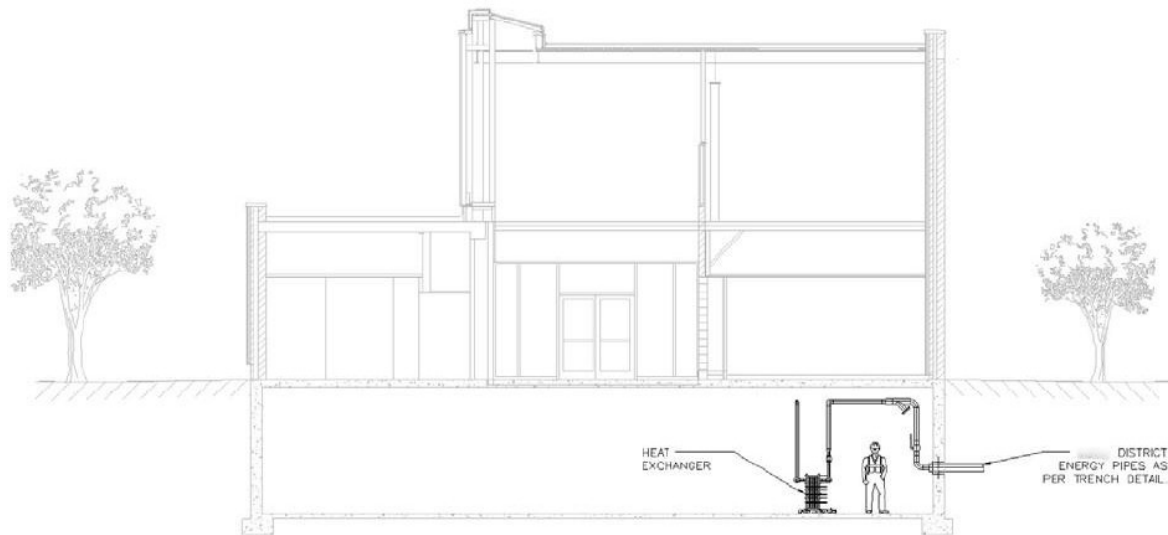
TYPICAL ETS INSTALLATION IN BUILDING BASEMENT
